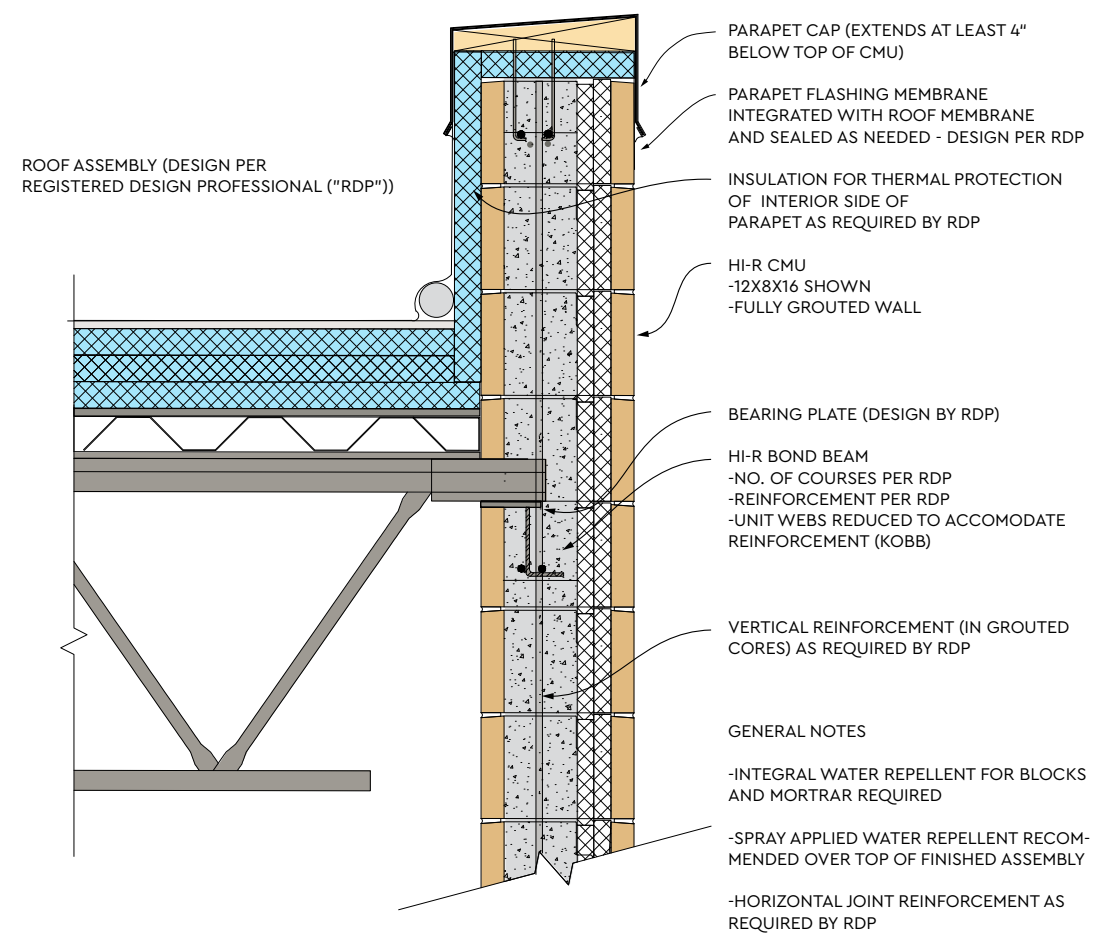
Roof and Parapet HI-R Fully Grouted (Bearing)
